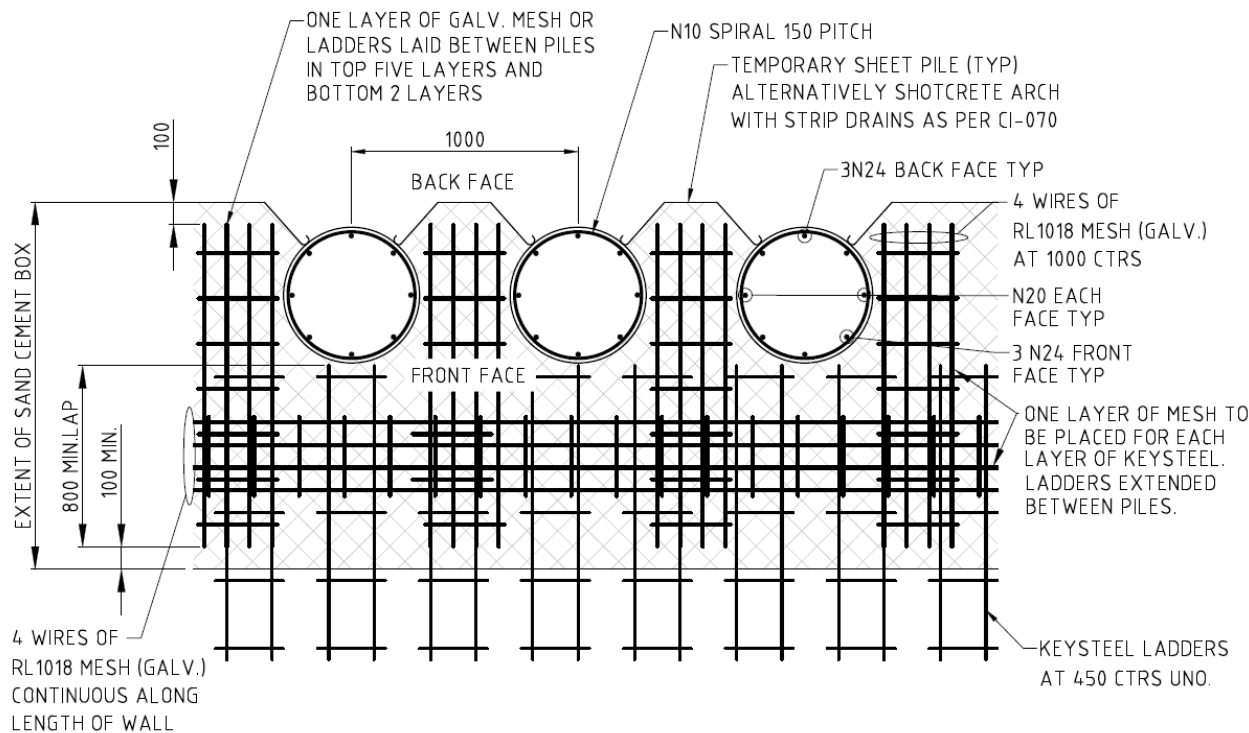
Detail of anchorage of reinforced soil reinforcement into a pile wall.
